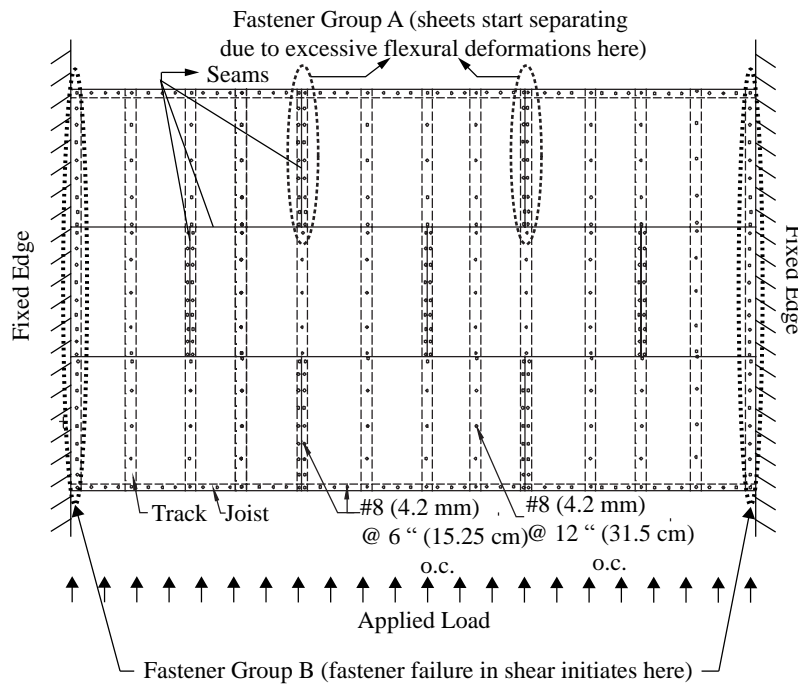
Fastener failure locations in a wood-sheathed cold-formed steel diaphragm (adapted from (NAHBRC 1999))
